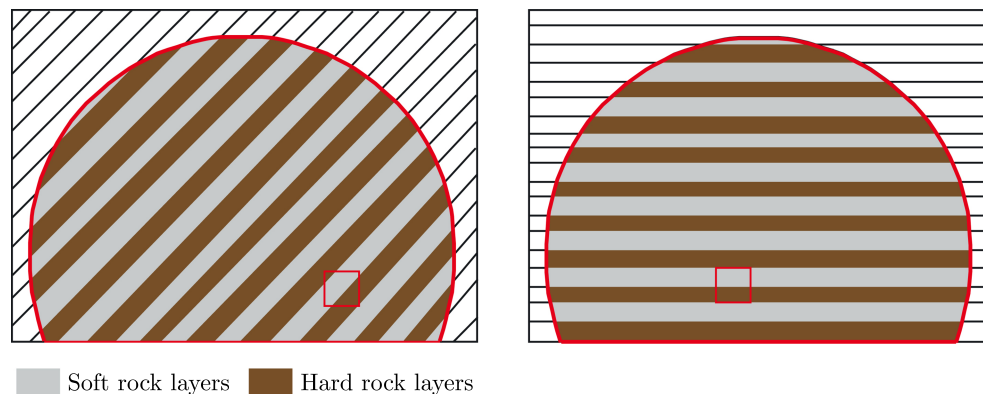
Tunnel excavation in a soft-hard interbedded rock mass
